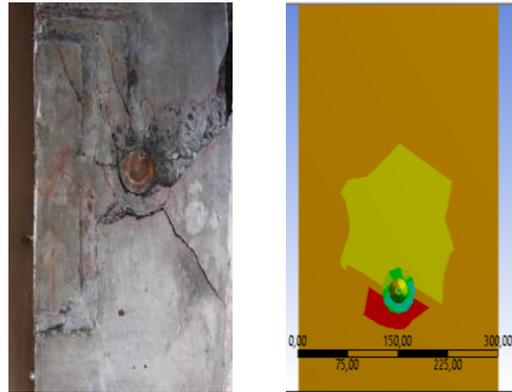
Crack at concrete block near male part at K1C1P1 case
